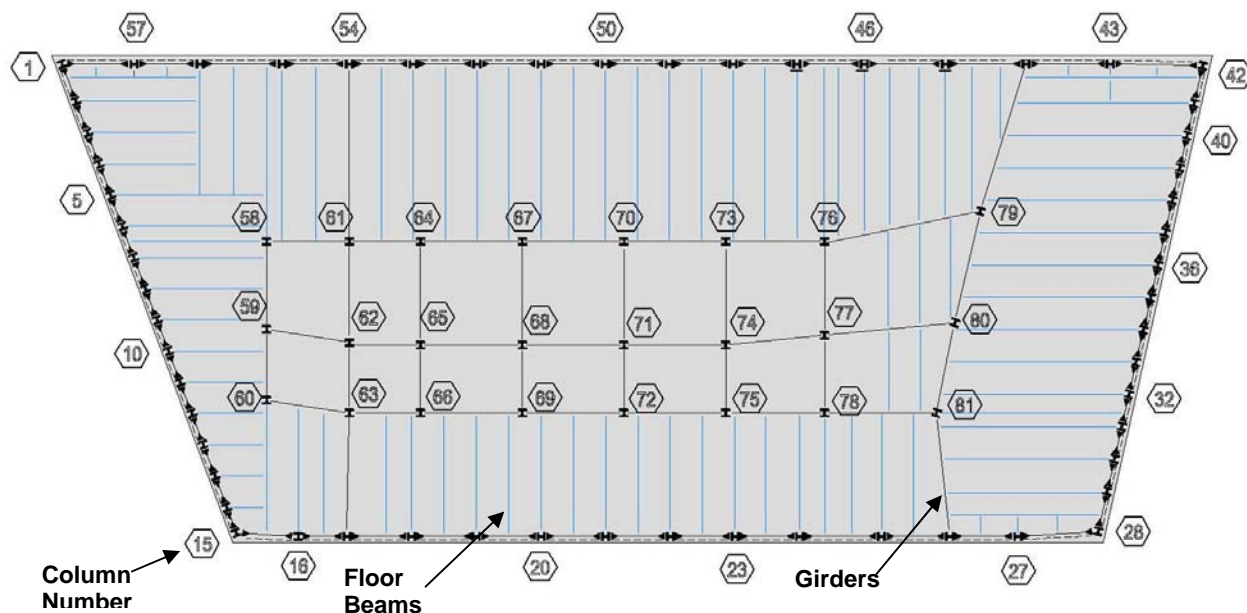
Typical WTC 7 floor showing locations of the columns, girders, and beams.
